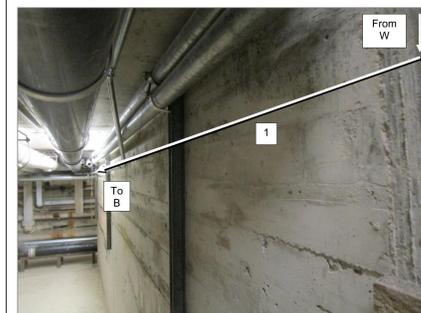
Location X, conduit bends 90 degrees and follows vertical channels on wall
